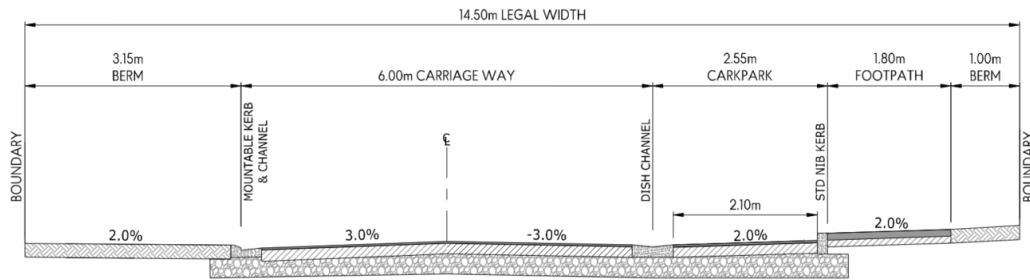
Typical Cross-Section (G) Local Road - 14.5m With Carpark
